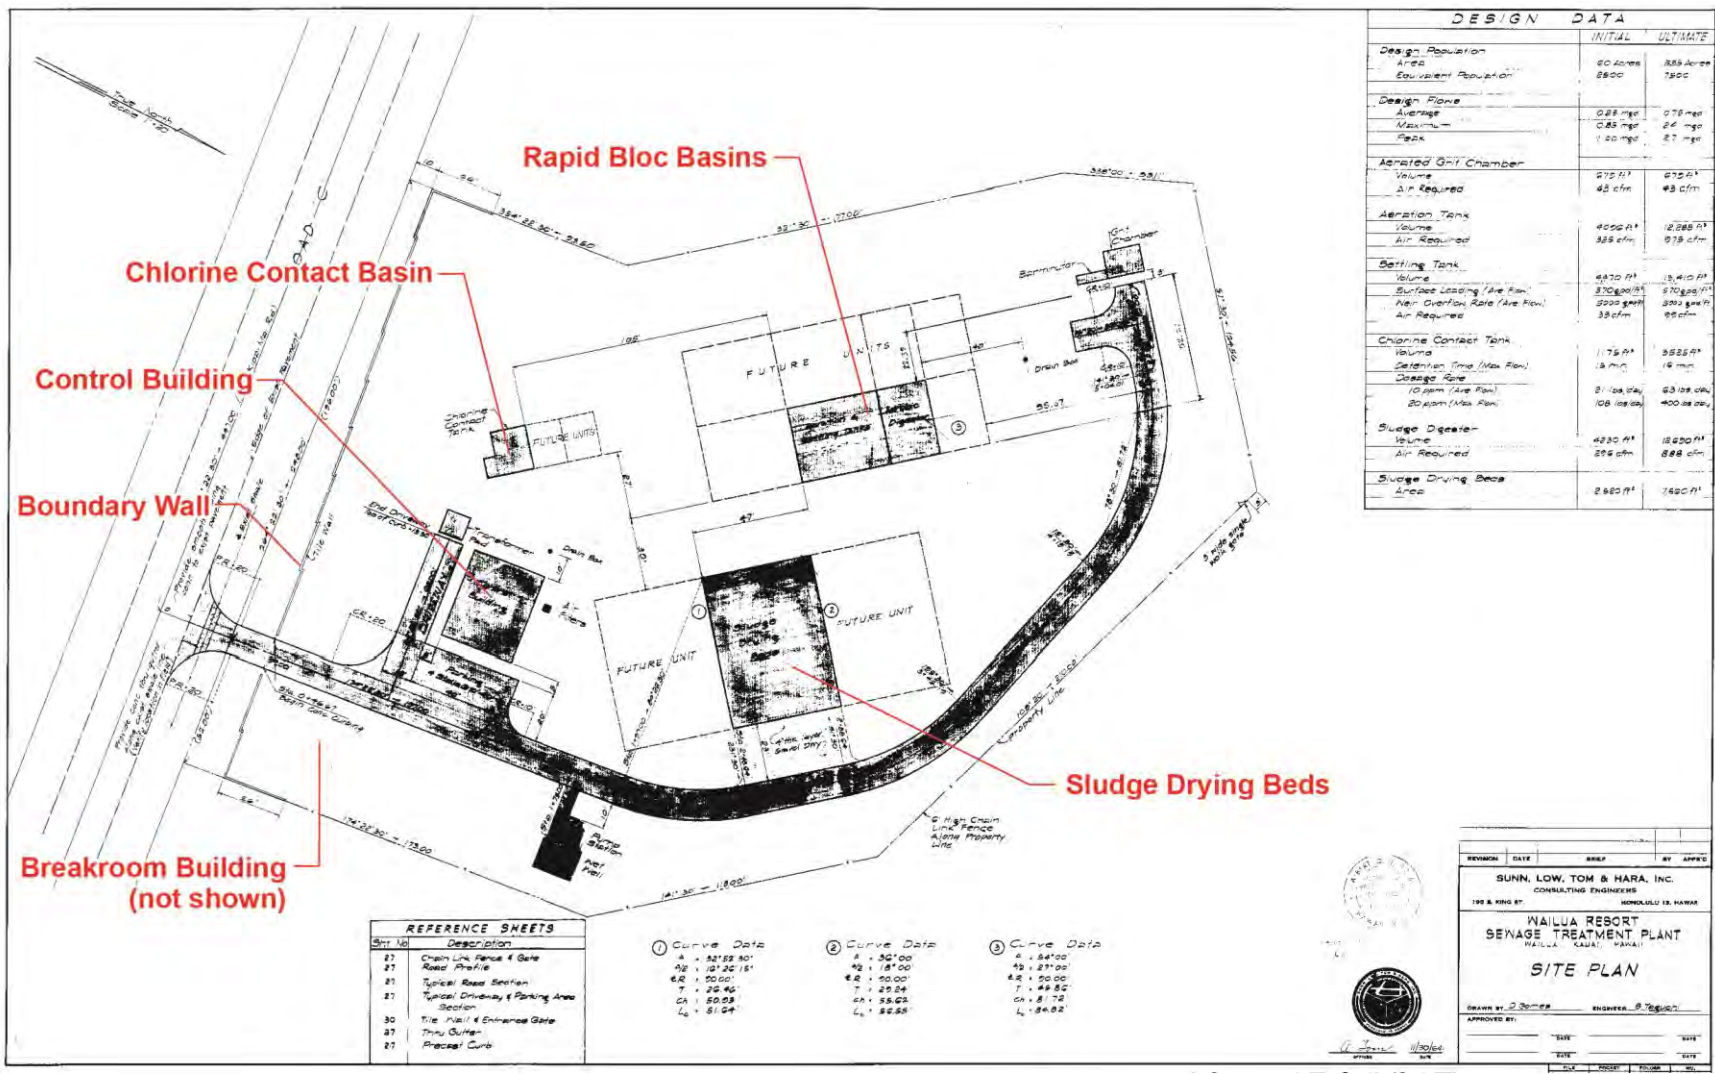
Wailua Wastewater Treatment Plant Site Plan, 1964.
